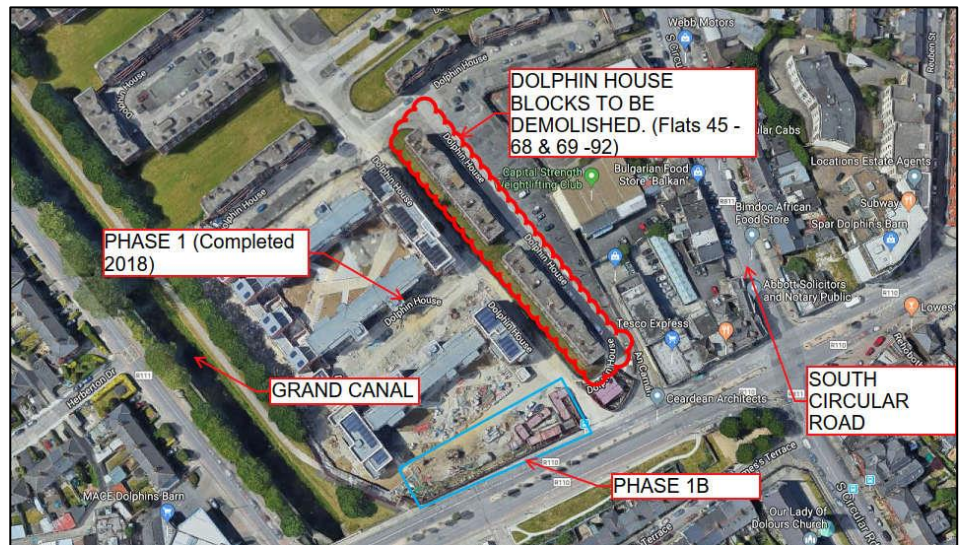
Site Context (red line shows indicative site area – refer to project documentation for full details)
